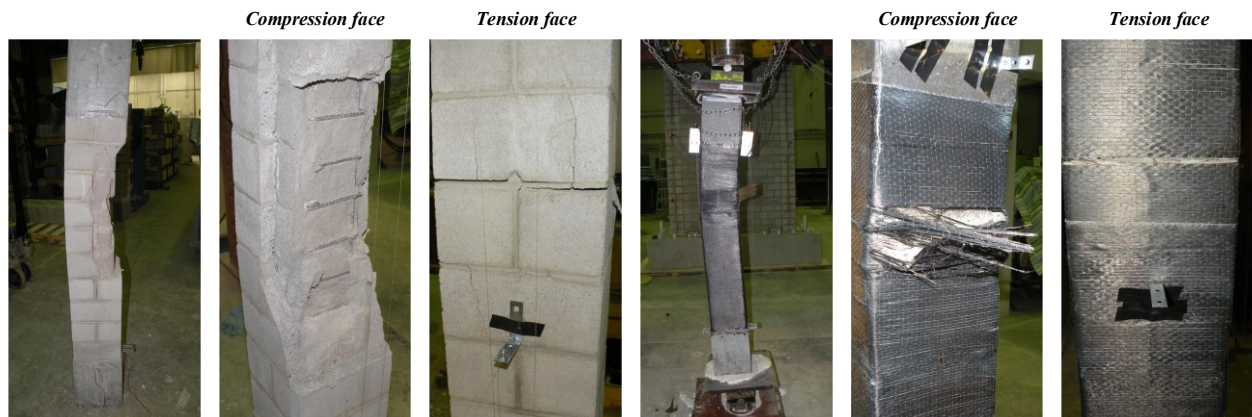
Typical failure modes of masonry columns tested under eccentric loading.
